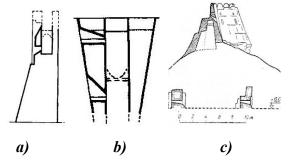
"Kizilkala" wall trim (a); Cutting edge of "Kyrghyzqal" (b); Cross-sectional view of cross-sectional surface (c)
